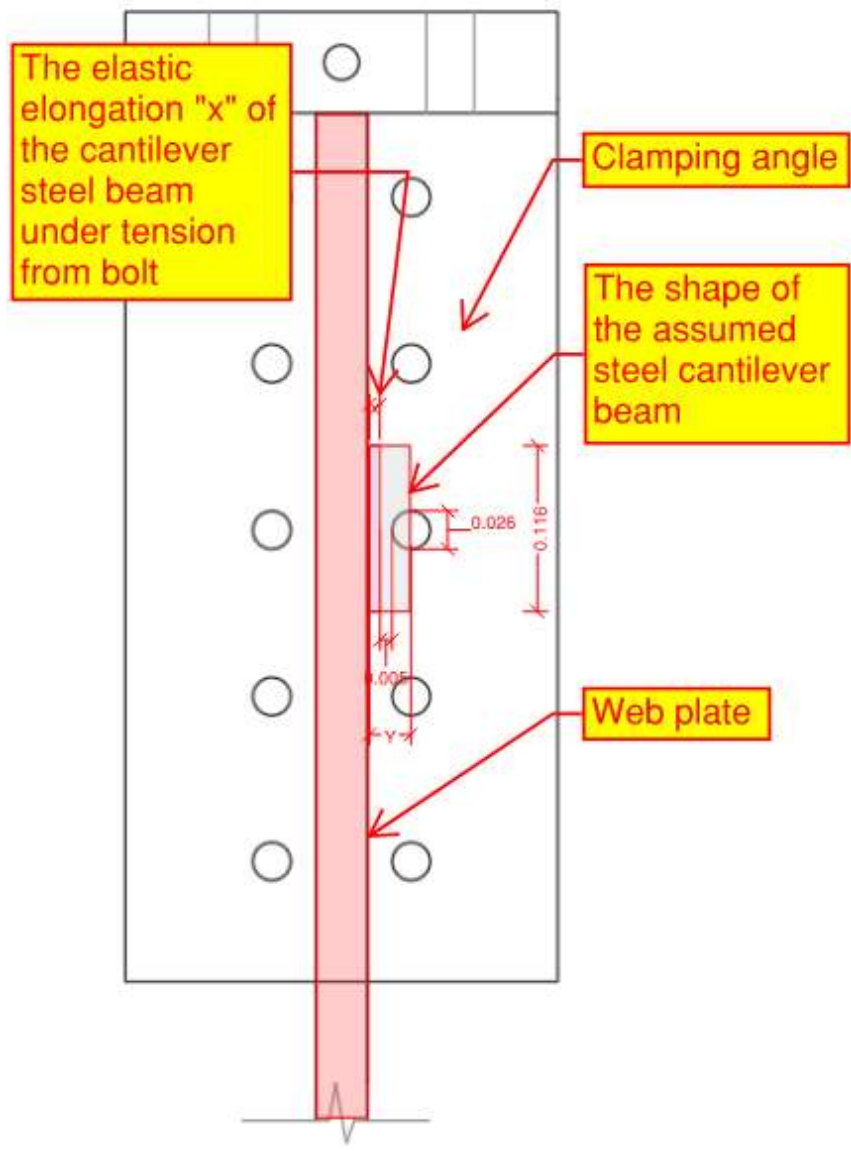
Dimensions for the steel cantilever part in calculation-front view
